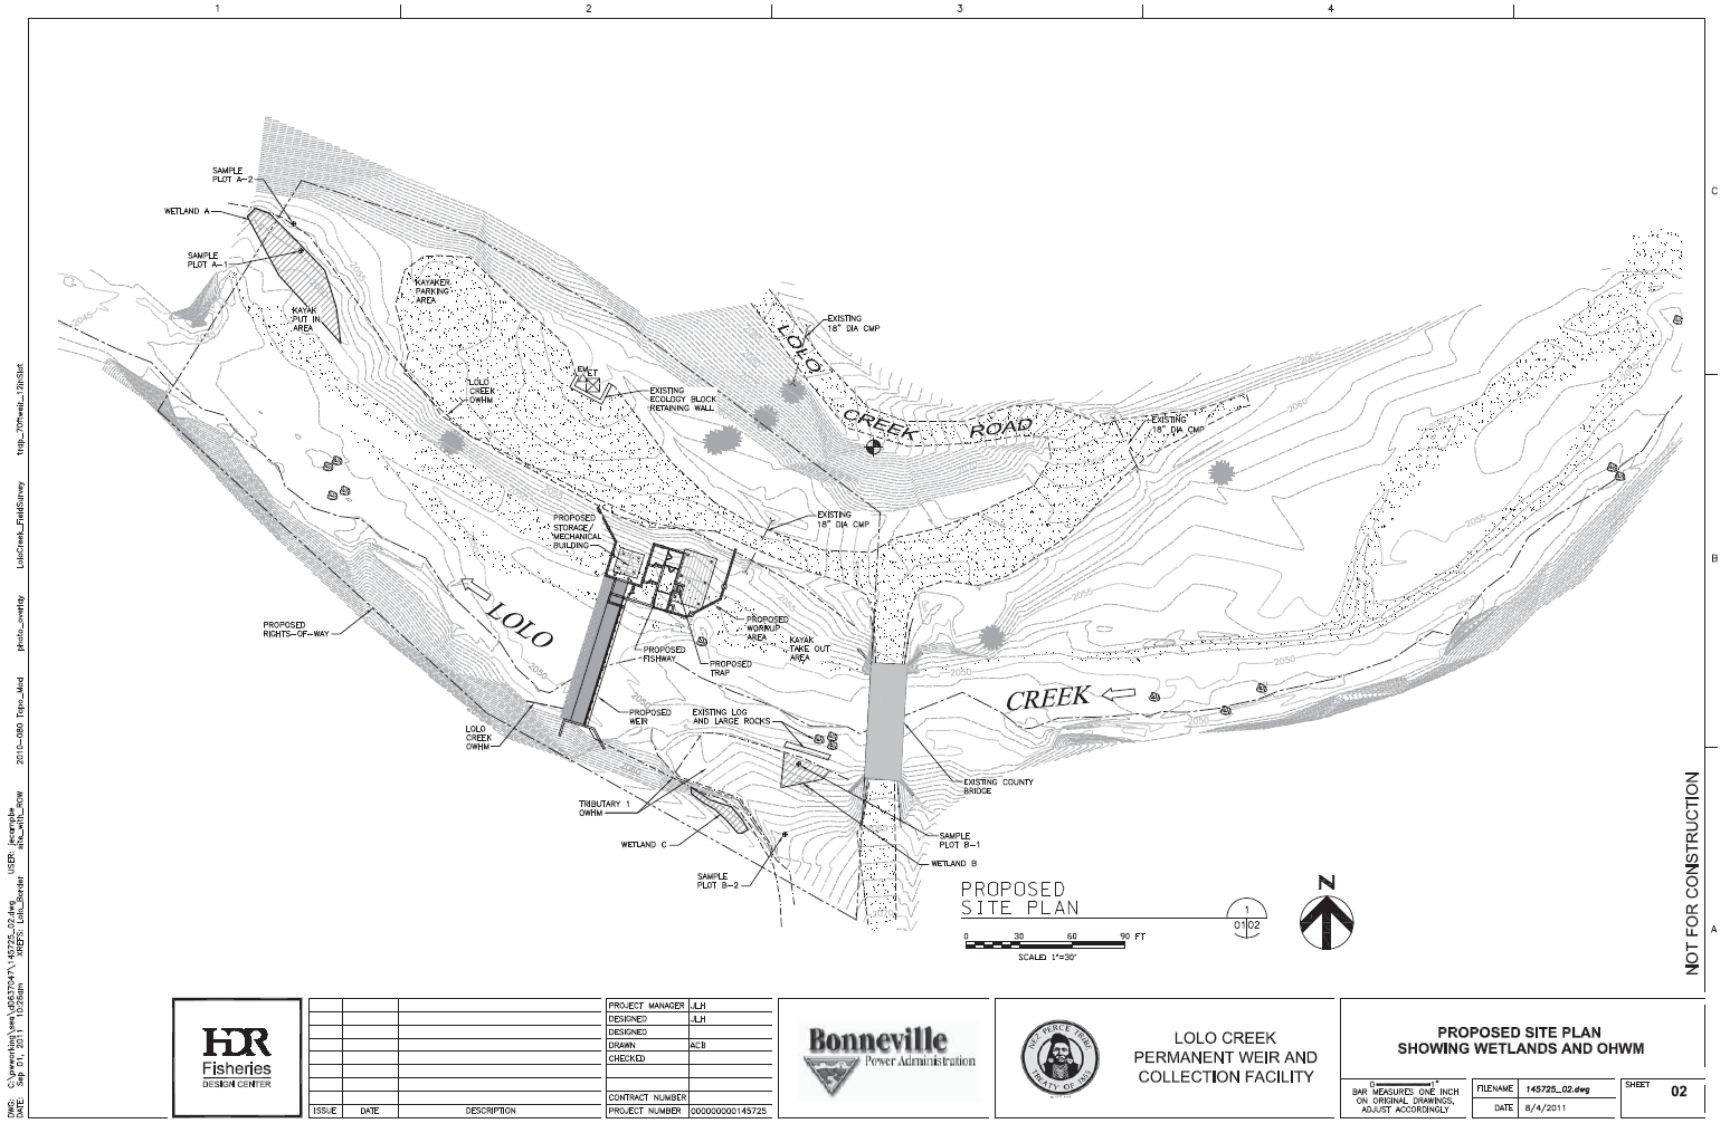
Lolo Creek Permanent Fish Weir, Proposed Site Plan.
